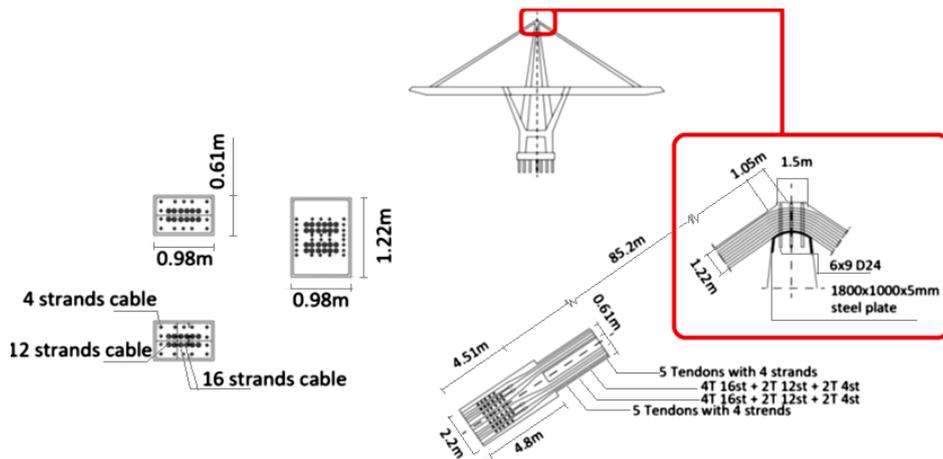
Polcevera Bridge (ID-6). View of the cable-stay system with the saddle detail (Morgese et al, 2020).
